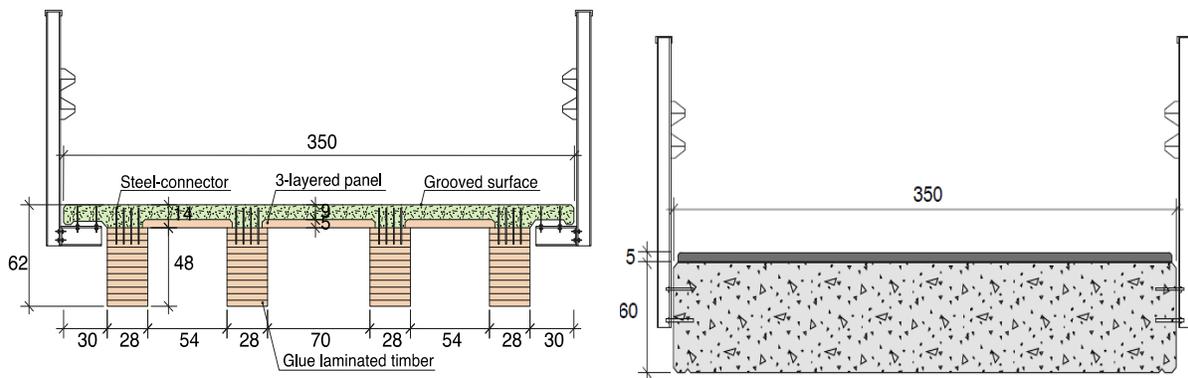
Alternatives: A) timber-UHPFRC; B) Reinforced-concrete bridge.
